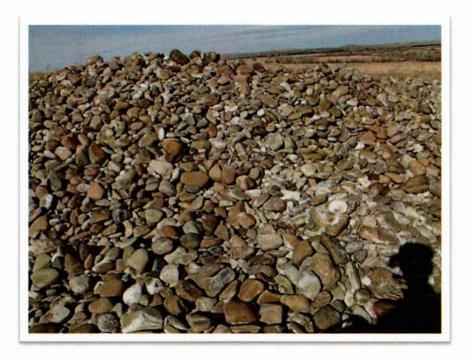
Stockpiled alluvium at the 10 acre tract of land.
